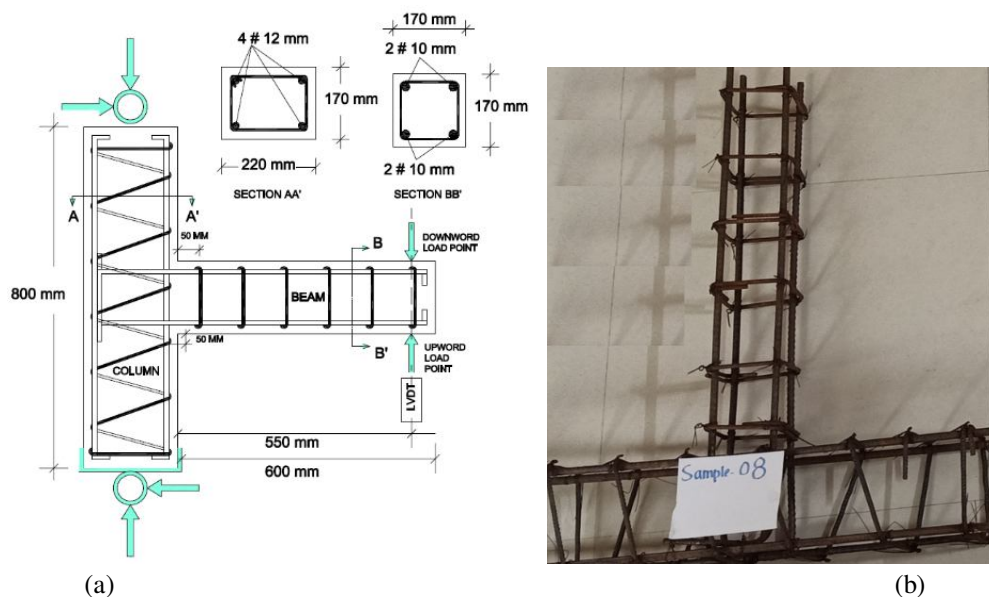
(a) Sectional View of Specimen, (b) Skeleton View
